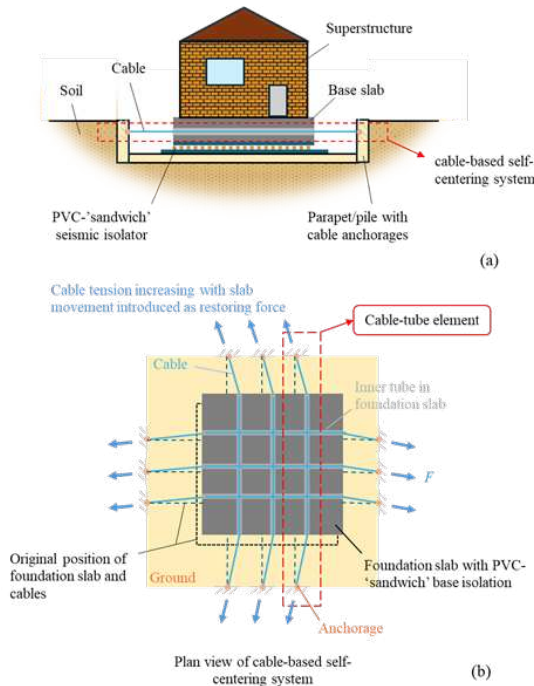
Concept of the cable-based self-centering system: (a) schematics of an exemplary application in a masonry building; (b) plan view of the system.
